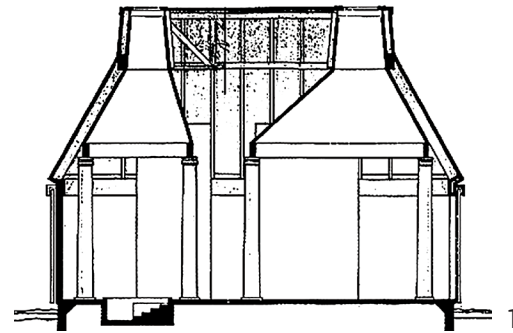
Moore House, Orinda, Charles Moore, 1962 (1) section, (2) plan (above) (Source: Authors' archive)
